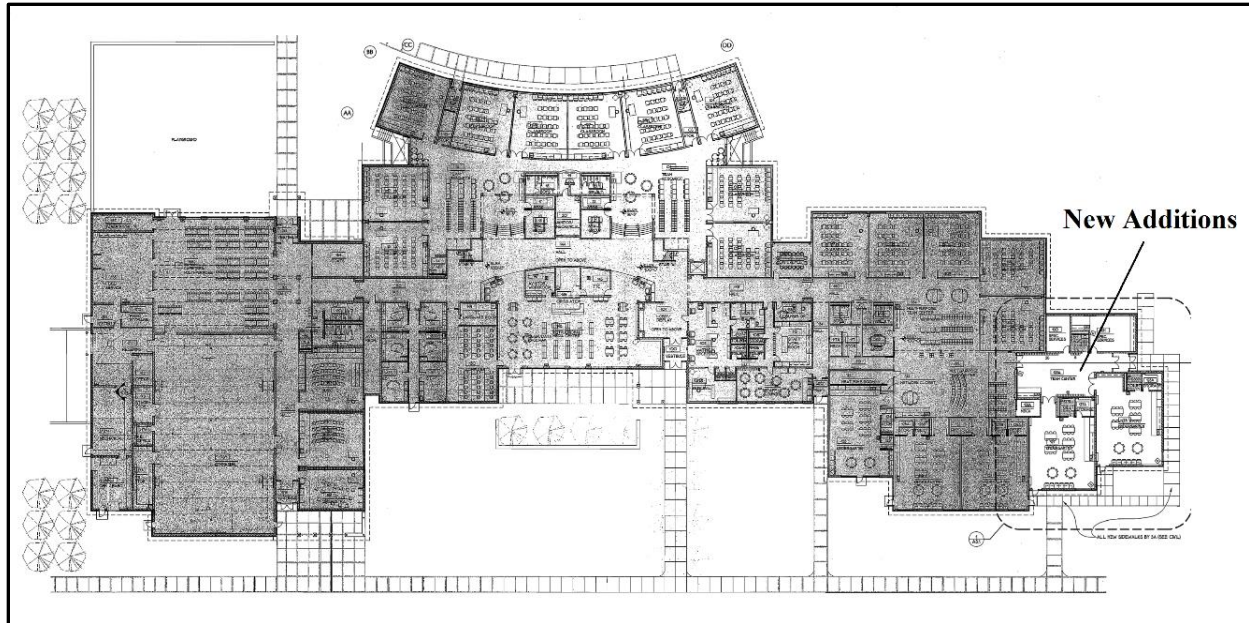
Bennett Elementary School 1st Floor Plan with New Additions
